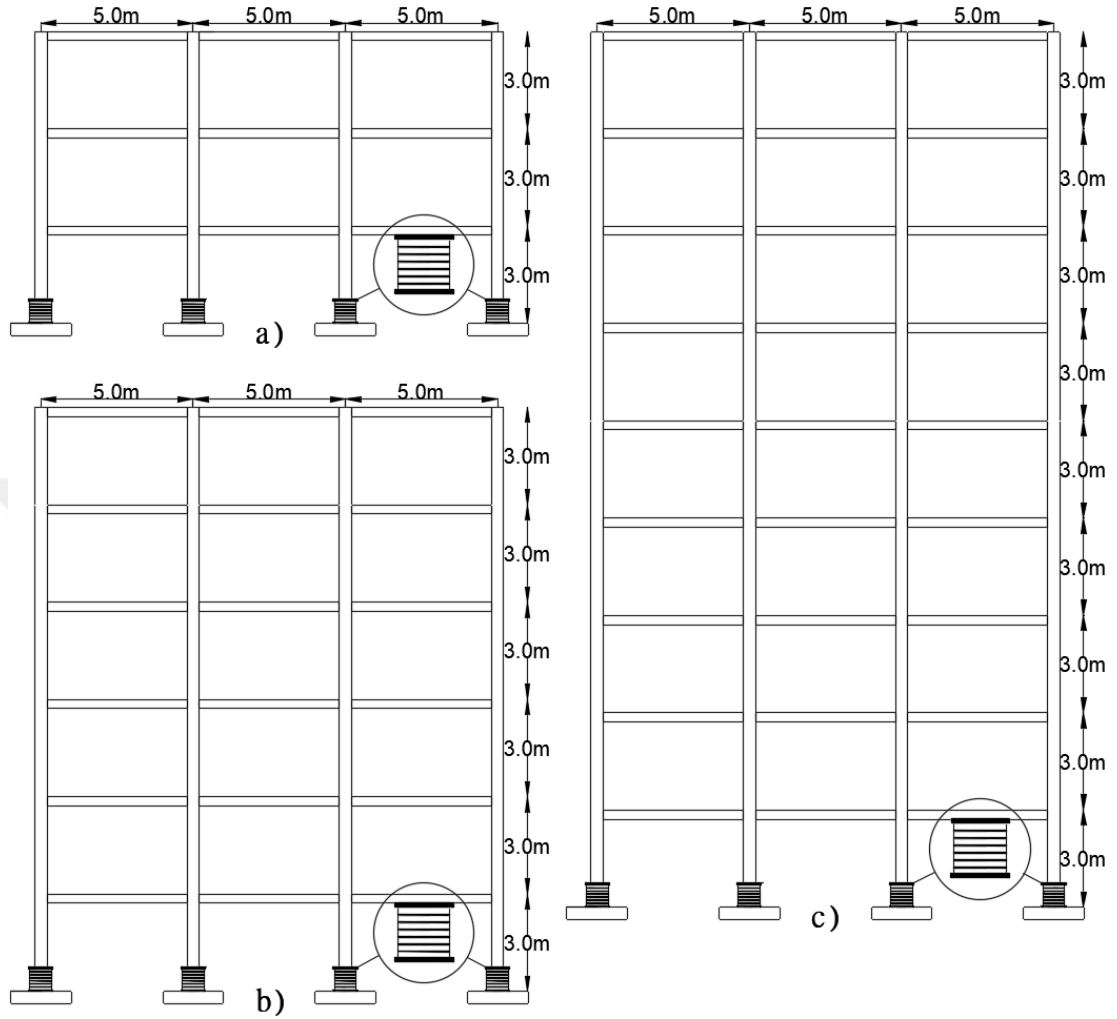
Elevation views of a) 3-storey, b) 6-storey, and c) 9-storey SMRF with HDRB under investigation
